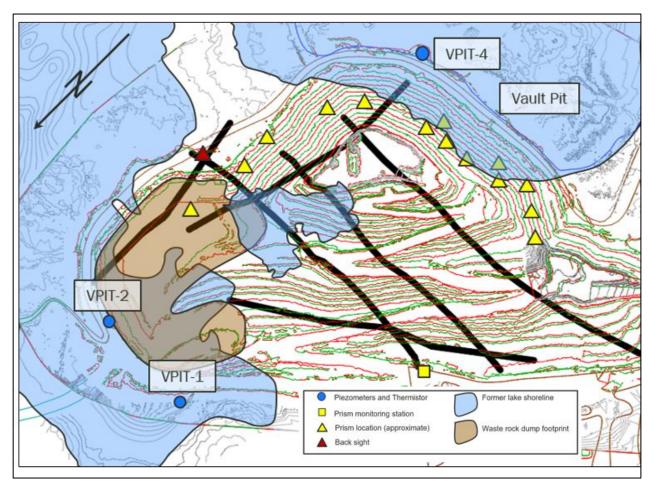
Vault Pit instrumentation plan (2018 Vault Plt)
